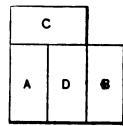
Section of a Corner Indicating a Better Method of Construction than shown in Previous Figure.
